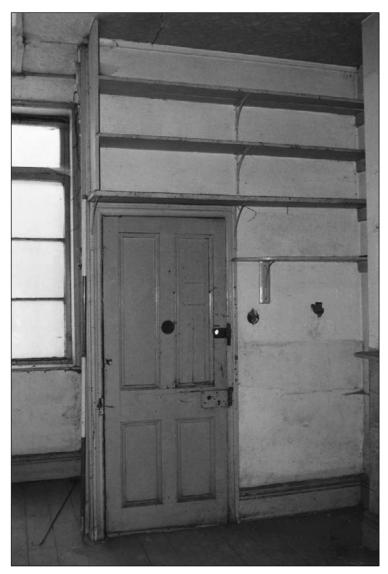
Detail of door and shelving, room F1 (film 25.27)
